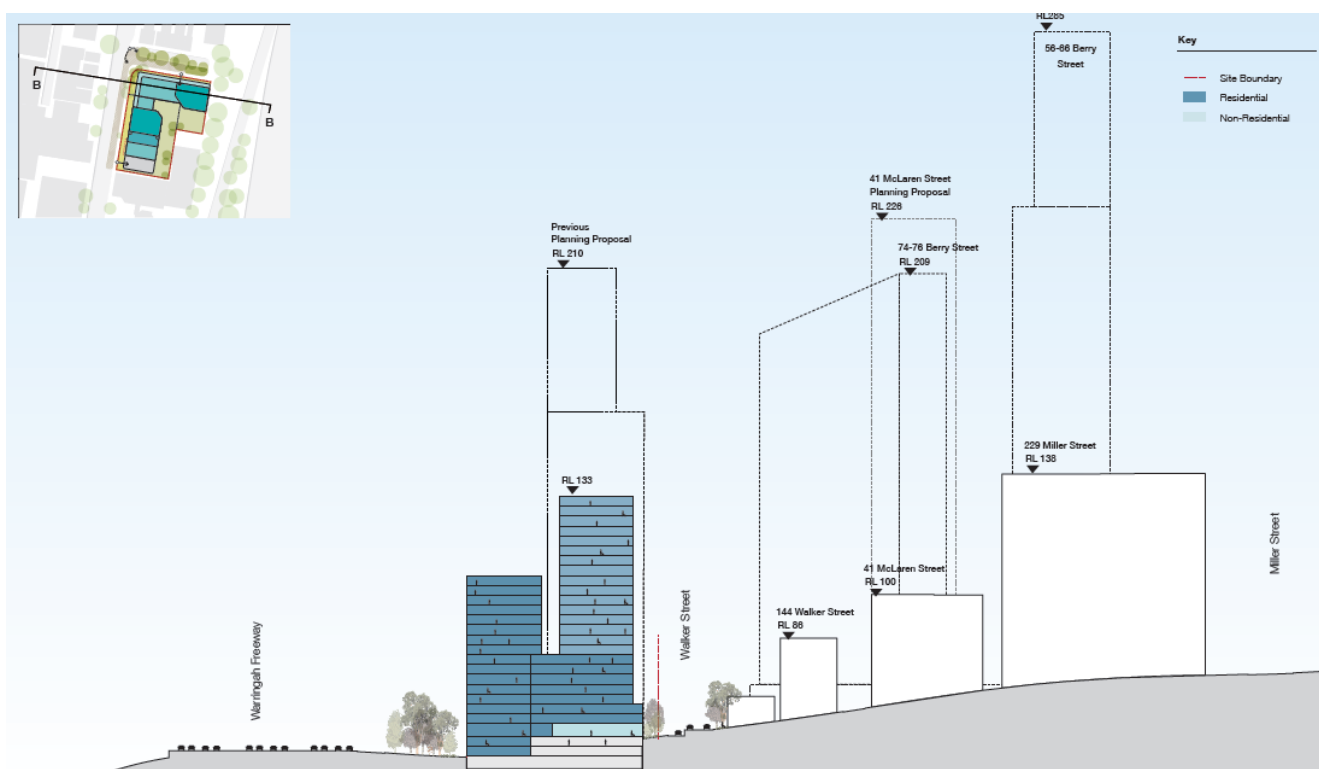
Concept of the proposed reference scheme looking south along Walker Street (source: SJB – overlay by DPIE)
